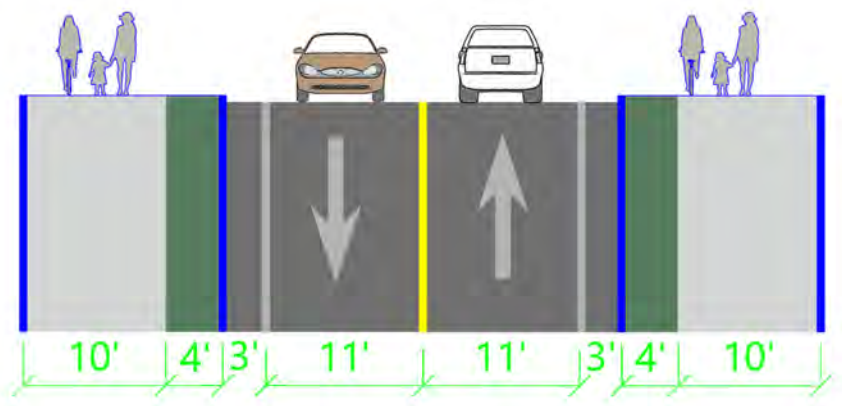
Recommended Sargent Road Cross-Section between US 12 and 196th Avenue
